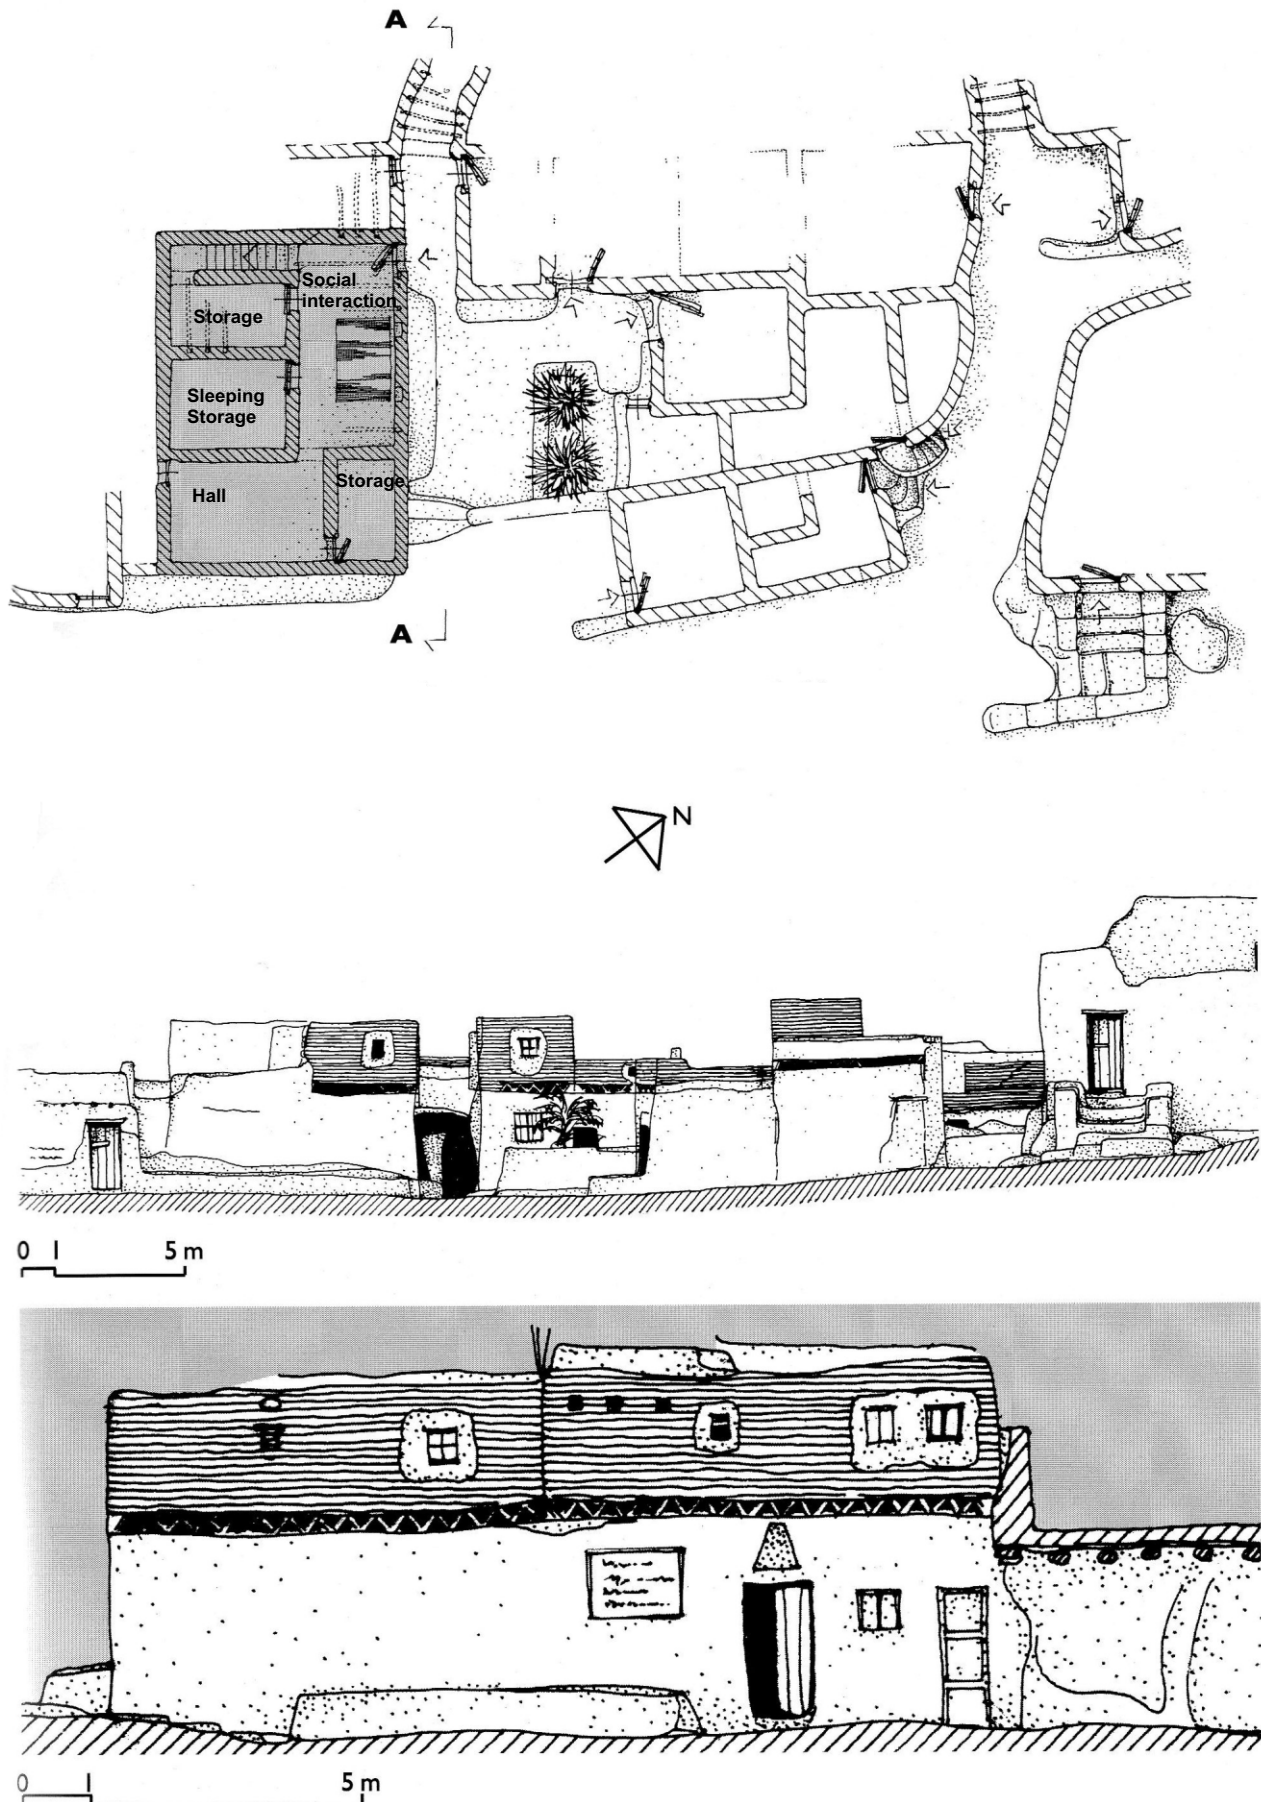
House 2, Bashendi. From top to bottom: Plan of the ground floor, elevation of the south-east facade and north-east facade and north east facade (profile A-A) (Schjins 2008, 39).
